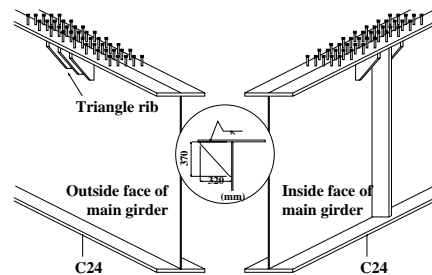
Detail of upper end of vertical stiffener at crossbeam connection
